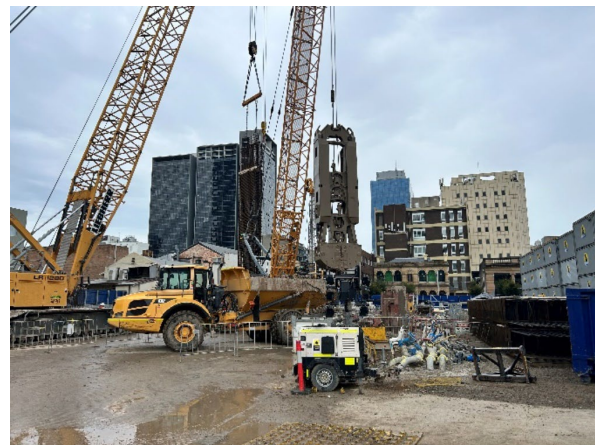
Parramatta site – D-Wall grab unloading spoil
